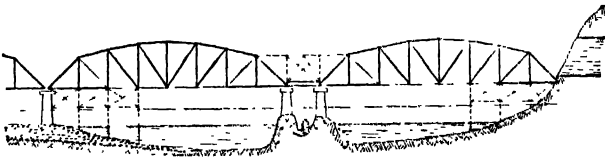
Layout of a Simple-truss Bridge Partially Erected by the Cantilever Method.
